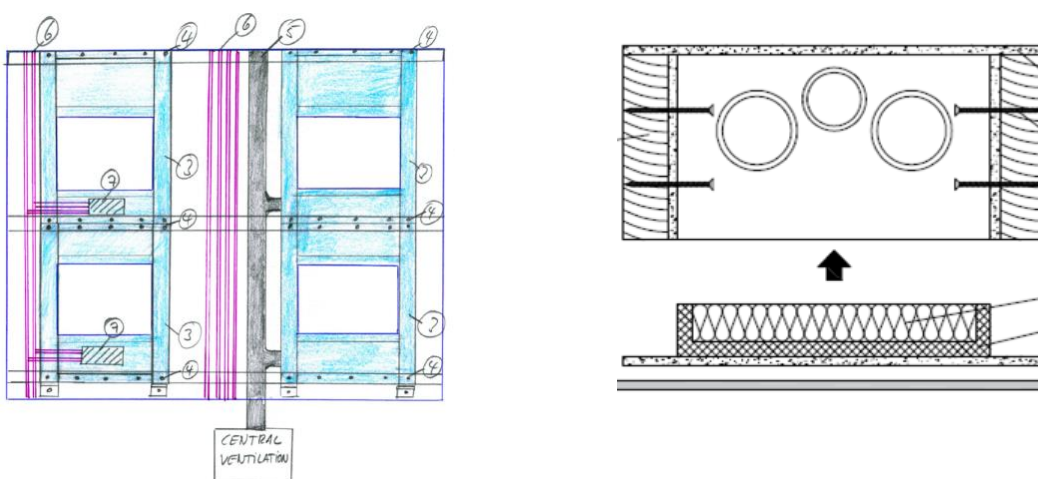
On the left installation of tubes and cables, on the right closing of installation shaft
